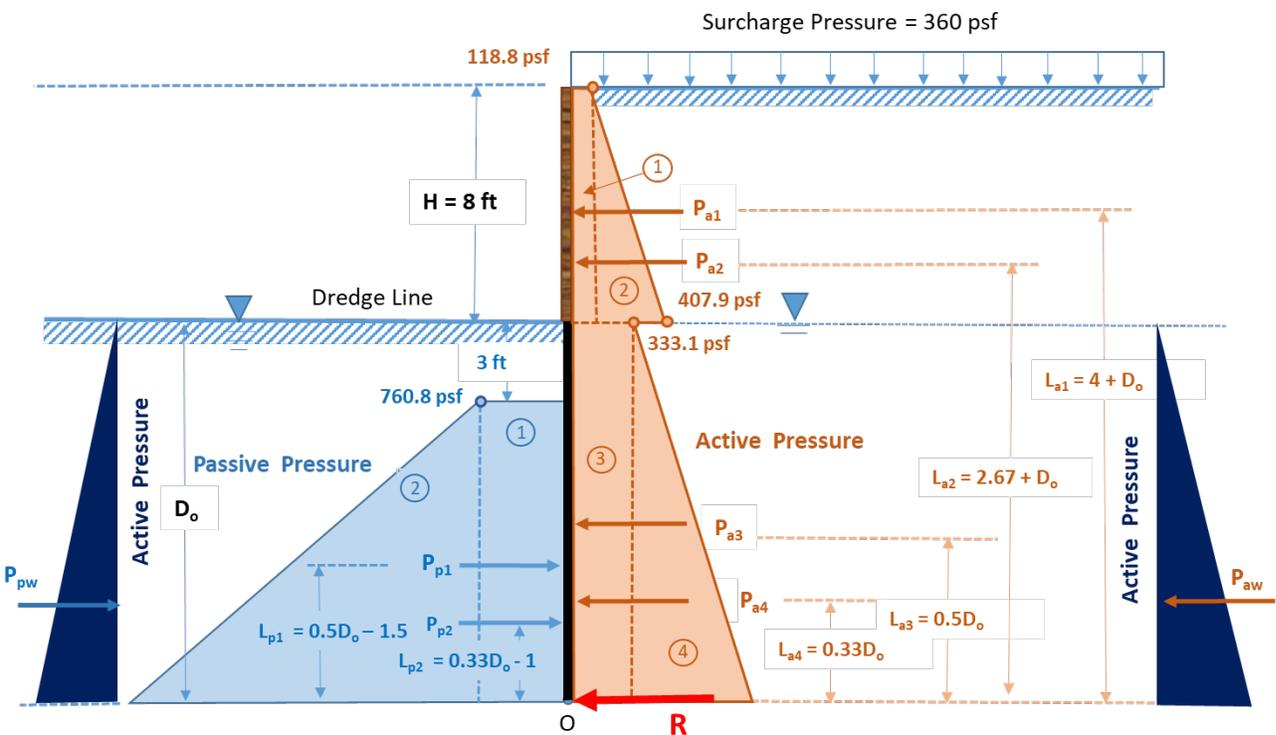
Case 9 Gross pressures, forces, and force locations acting on the sheet pile wall.
